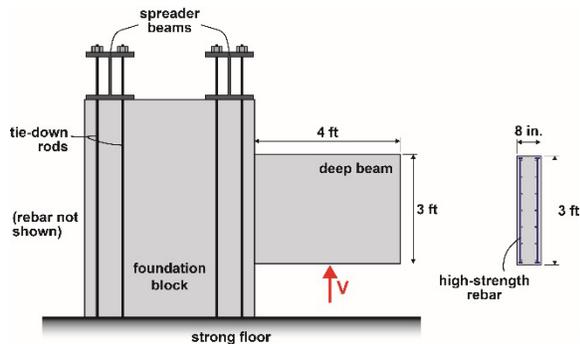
Preliminary elevation (left) and cross-section (right) views of deep beam specimens
